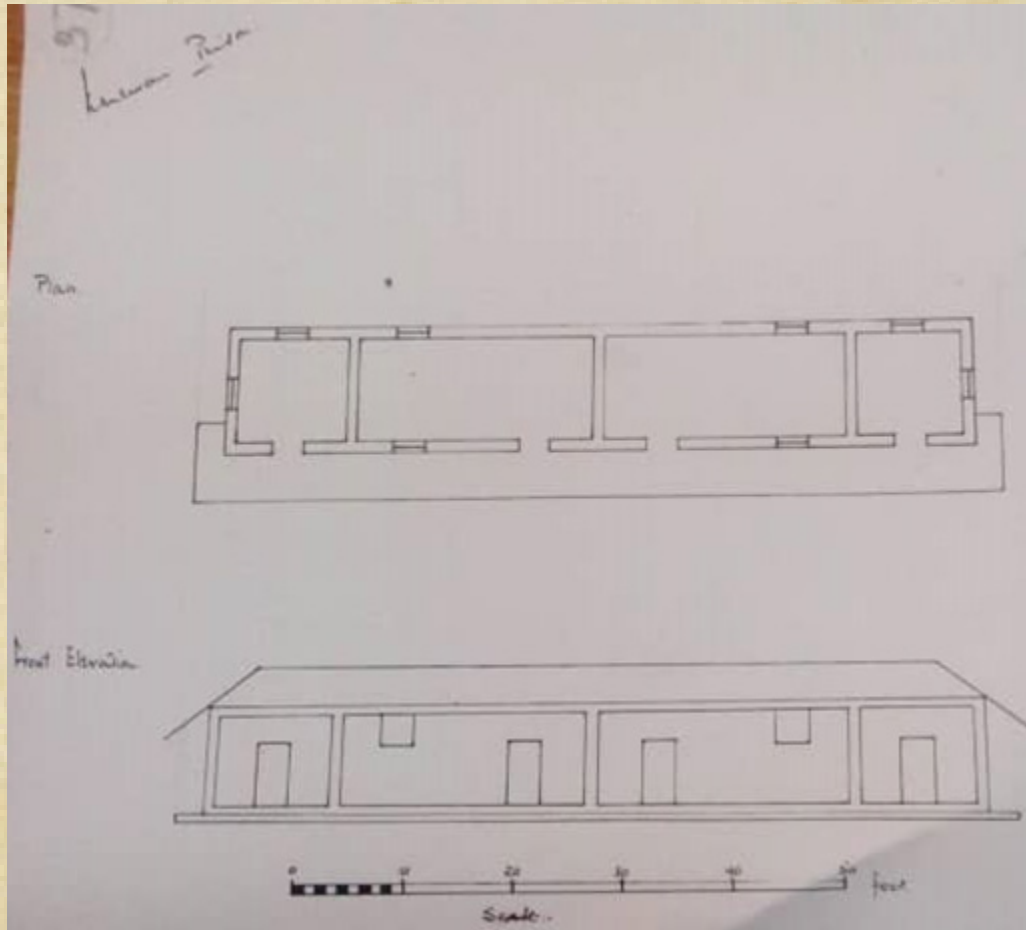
Proposed Colonial Kerewan Prison Building Plan. Courtesy of Gambia National Archive, Banjul, The Gambia.
